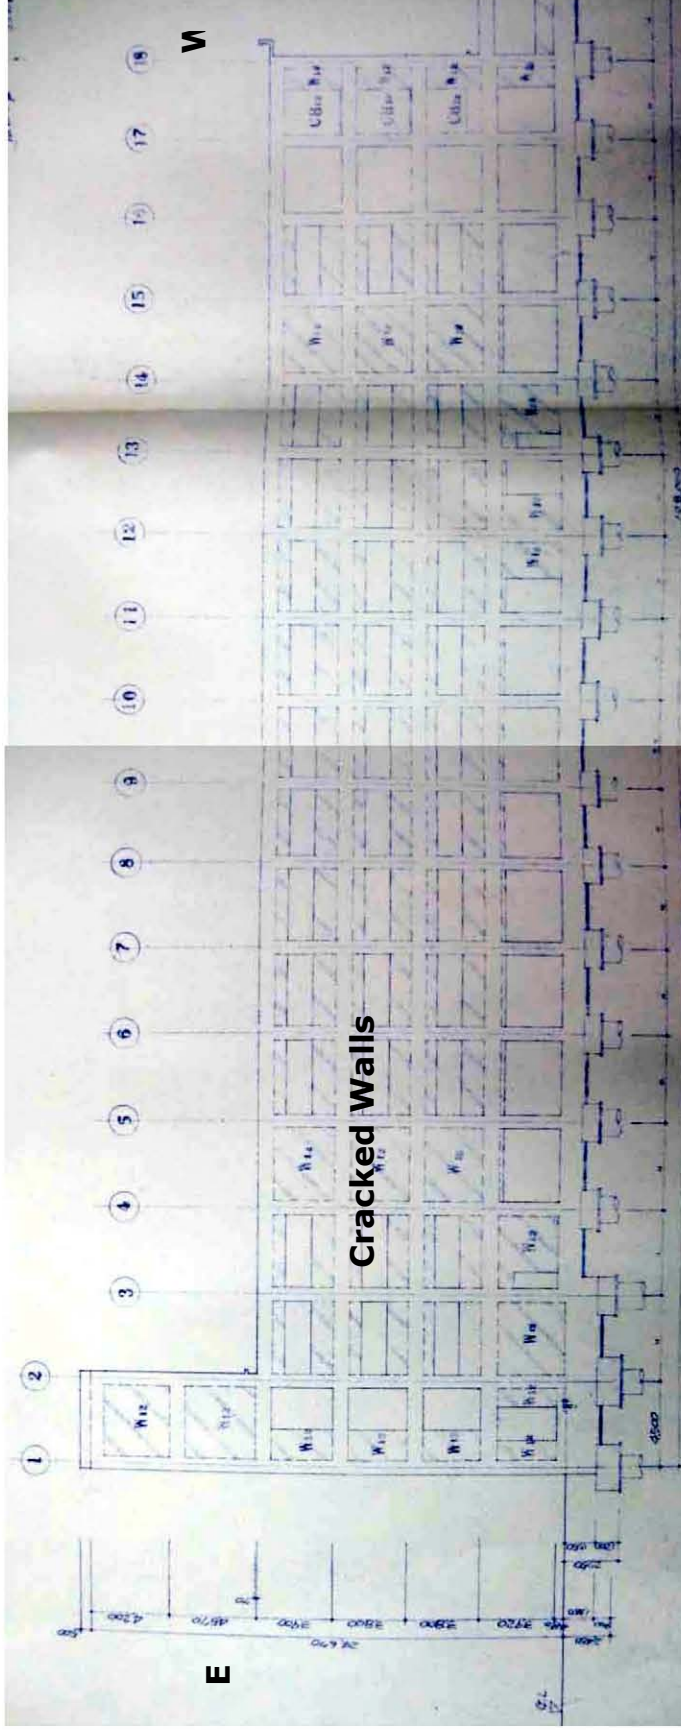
Kashiwazaki High School design drawings, vertical section, column line C.
